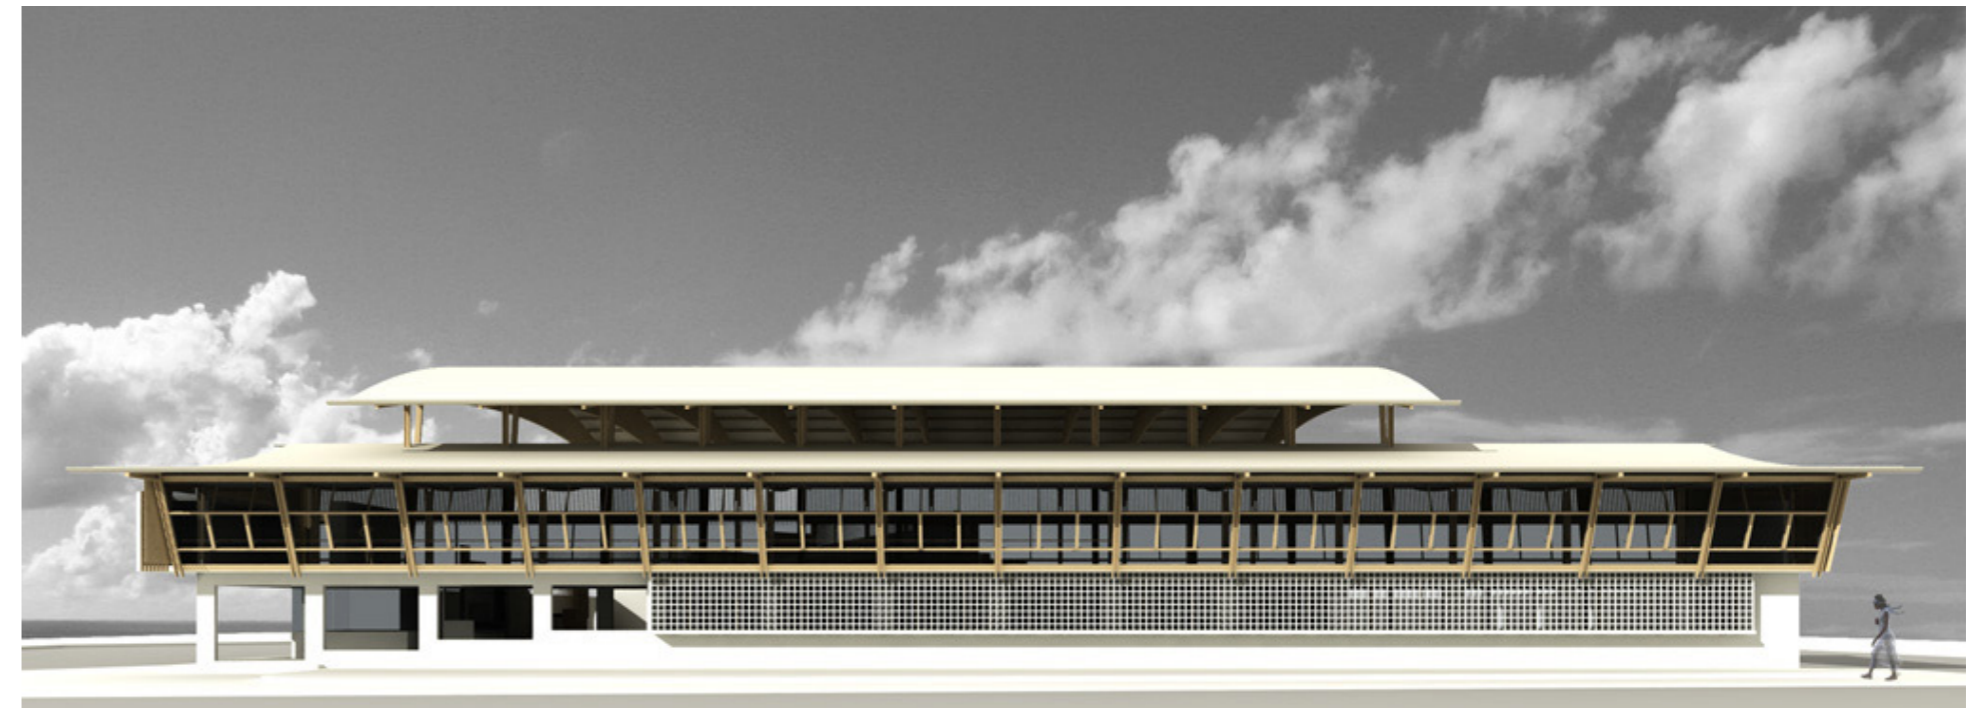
Fisheries museum - Street Elevation Render (Jose Forjaz Arquitectos. 2011)
